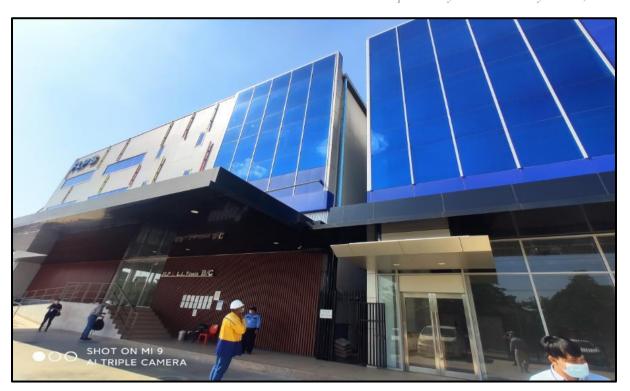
View of the Building B and Building C interconnected through Walkway
